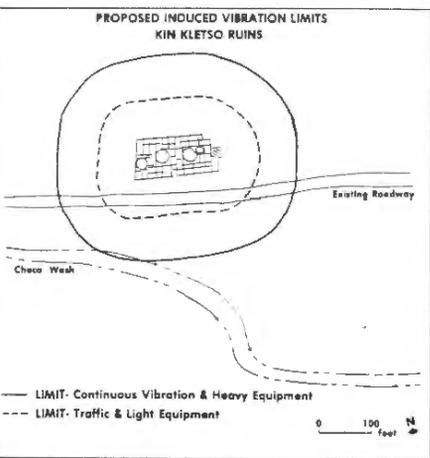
Recommended minimum distances for road building equipment and traffic.
